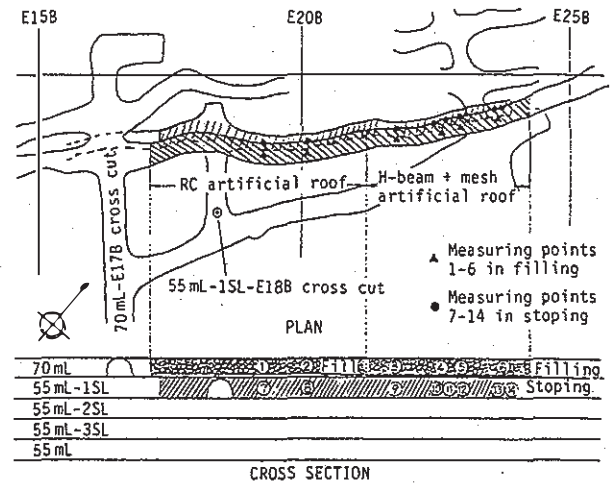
Plan and cross section of test site of the downward cut and fill stoping.
